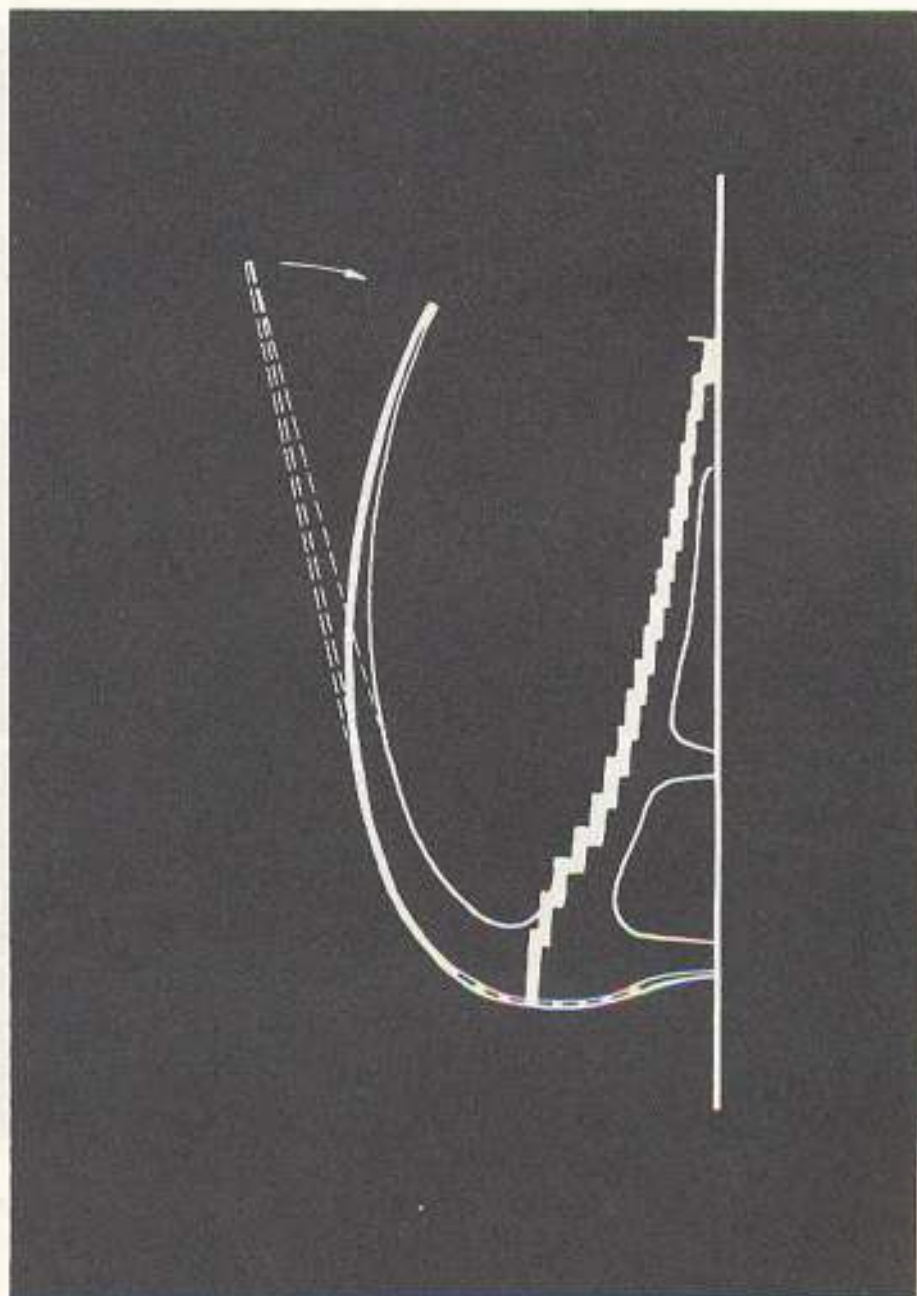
Elevational section in a stadium, showing the excessive deflection of the cantilevered roof.
